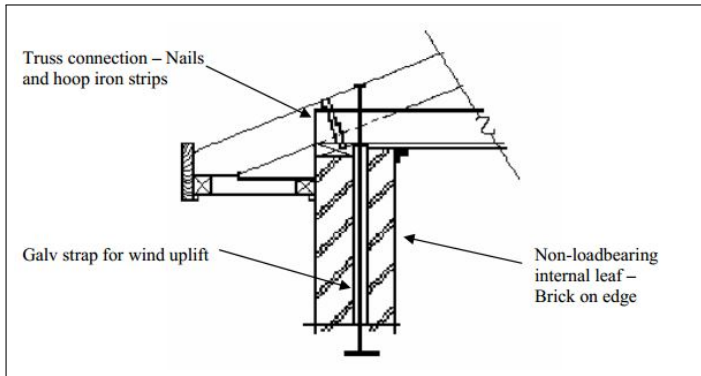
Cavity wall roof connection with outer wall as load-bearing
